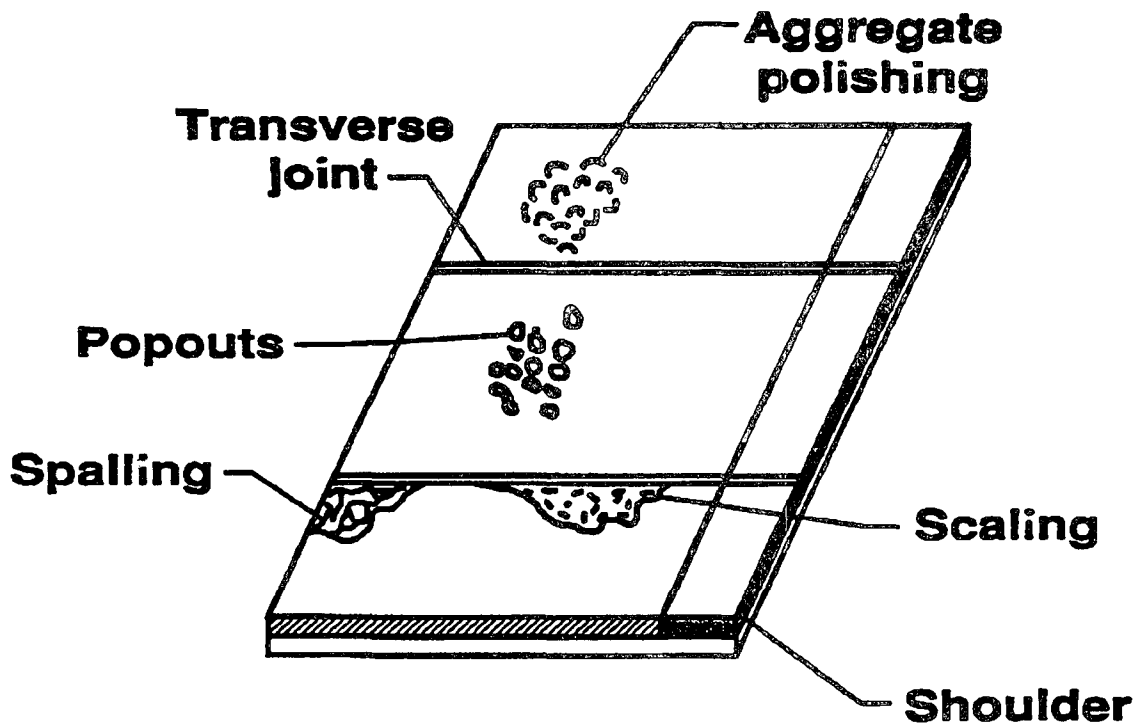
Drawing of examples of some distresses that could occur in jointed concrete pavements.
